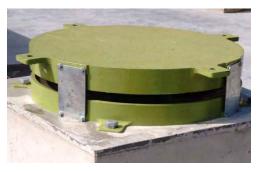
53 Victoria Street – Base Isolated building - under construction – friction pendulum bearing
